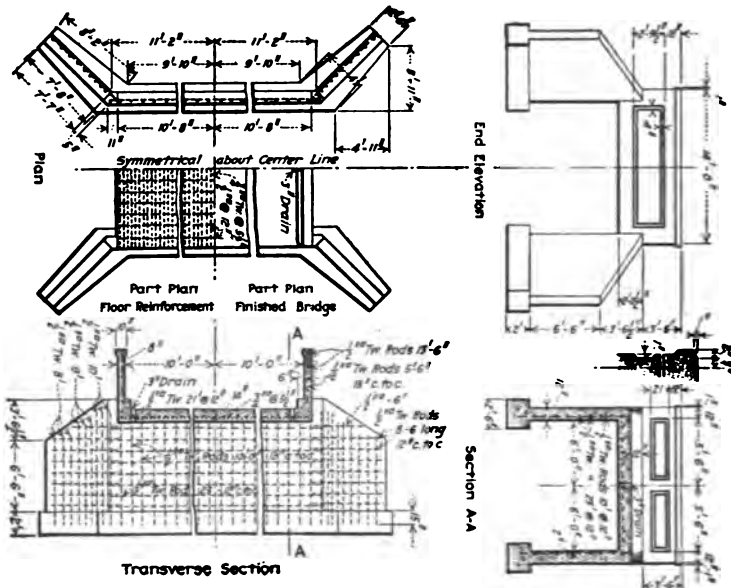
Standard design for slab bridges of 12-ft. span, Wisconsin Highway Commission.
